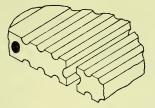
Taylor's Modern 1-in. Damp-proof Course.
